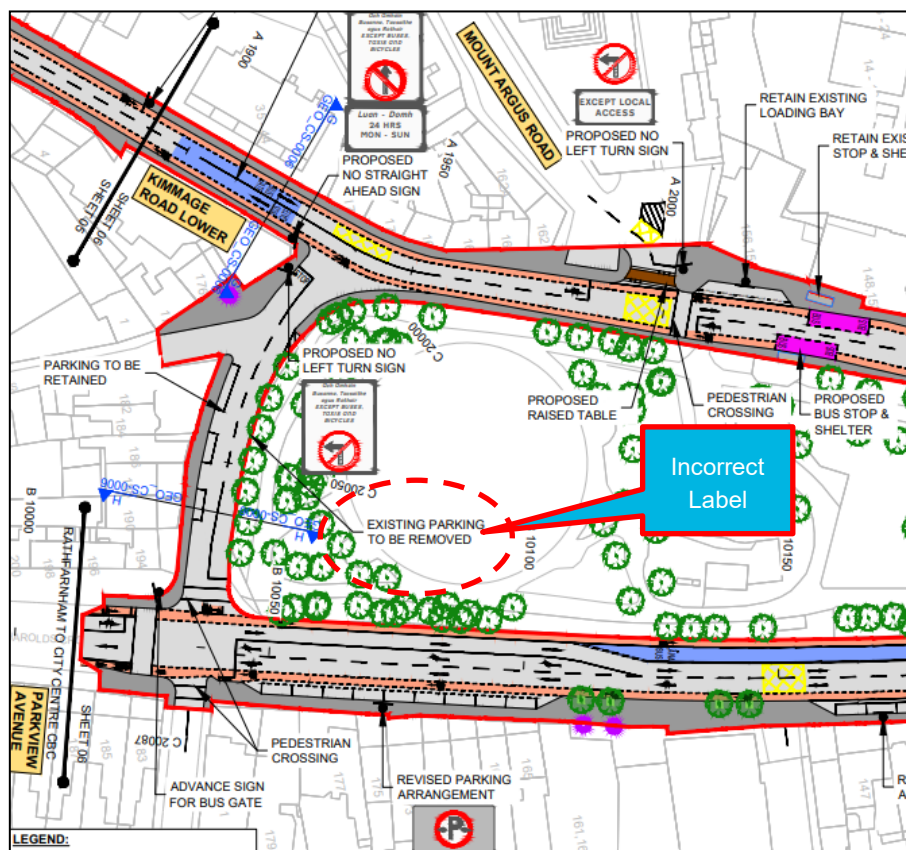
General Arrangements Drawing Sheet No.6 at Harold's Cross Park South
